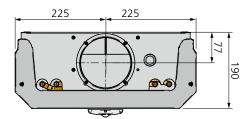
Dimensions ADRIATIC VAV Prisma, end view air connection
